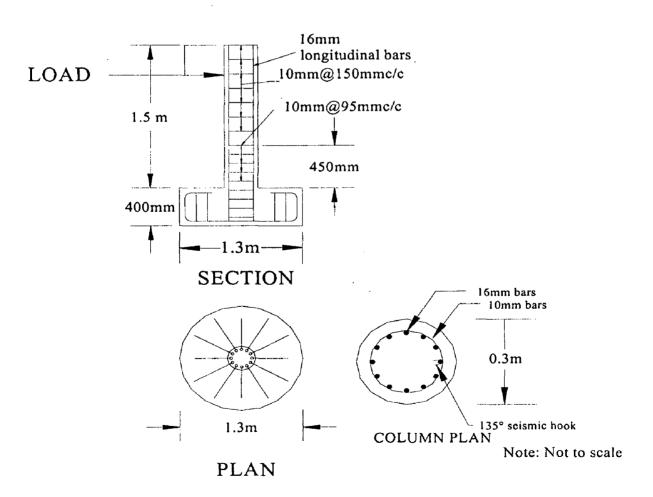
Reinforcement Detailing of Models M1 and M2
